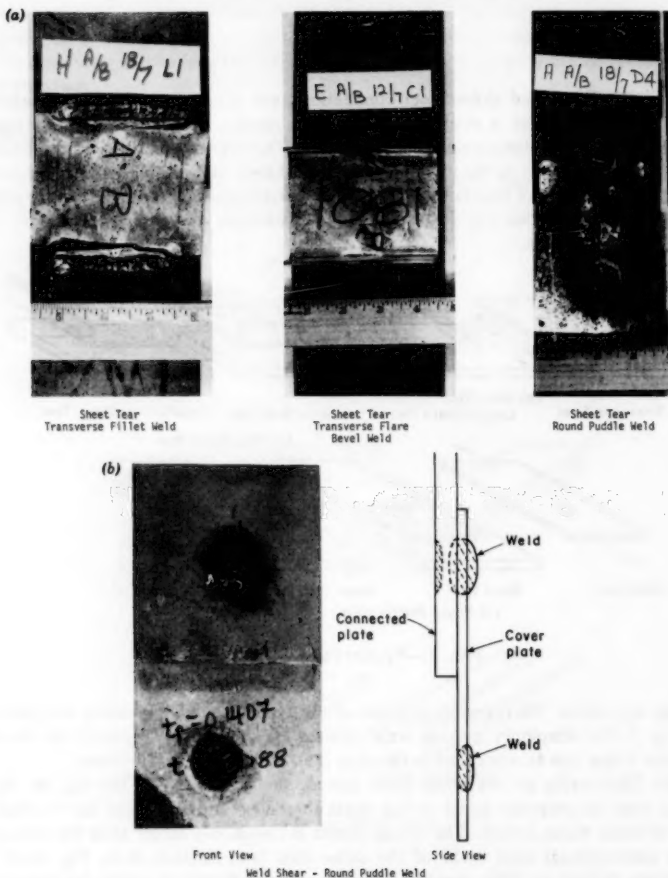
Typical Failure Modes, Specimens after Failure: (a) Sheet Tear; and (b) Weld Shear
